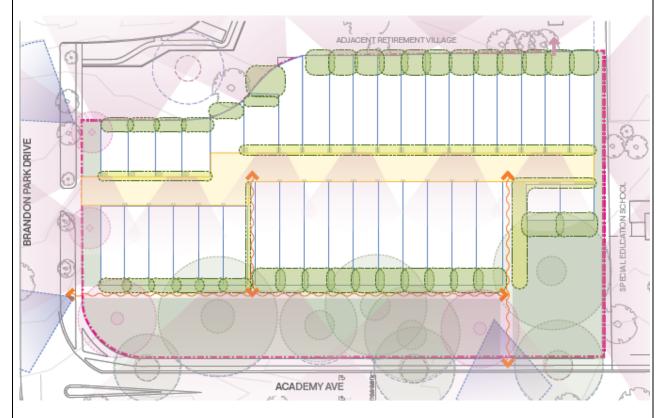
Extract of Place-Making Plan – (Source: Rothe Lowman Architects)
